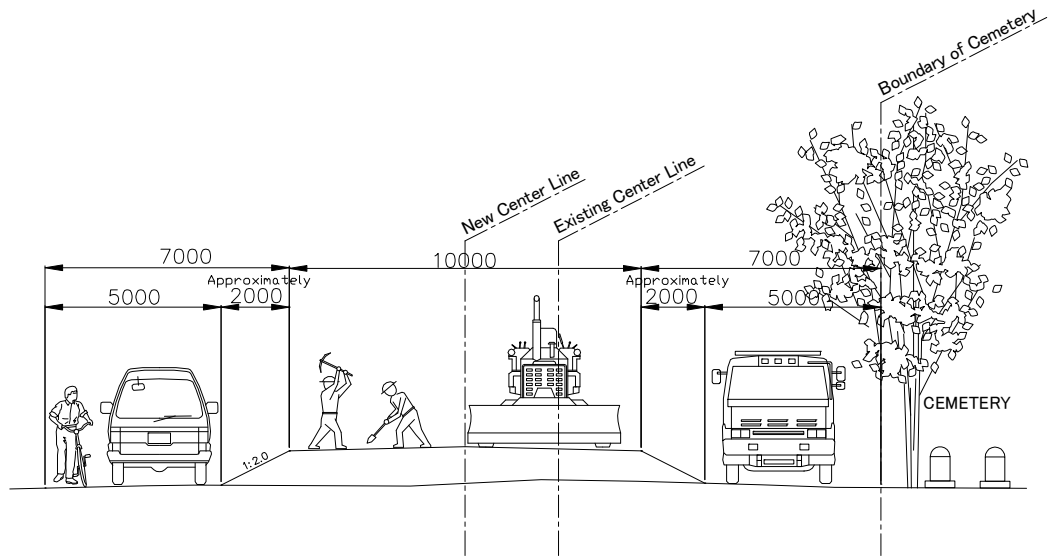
Construction Area Concept (e.g. Cemetery)
